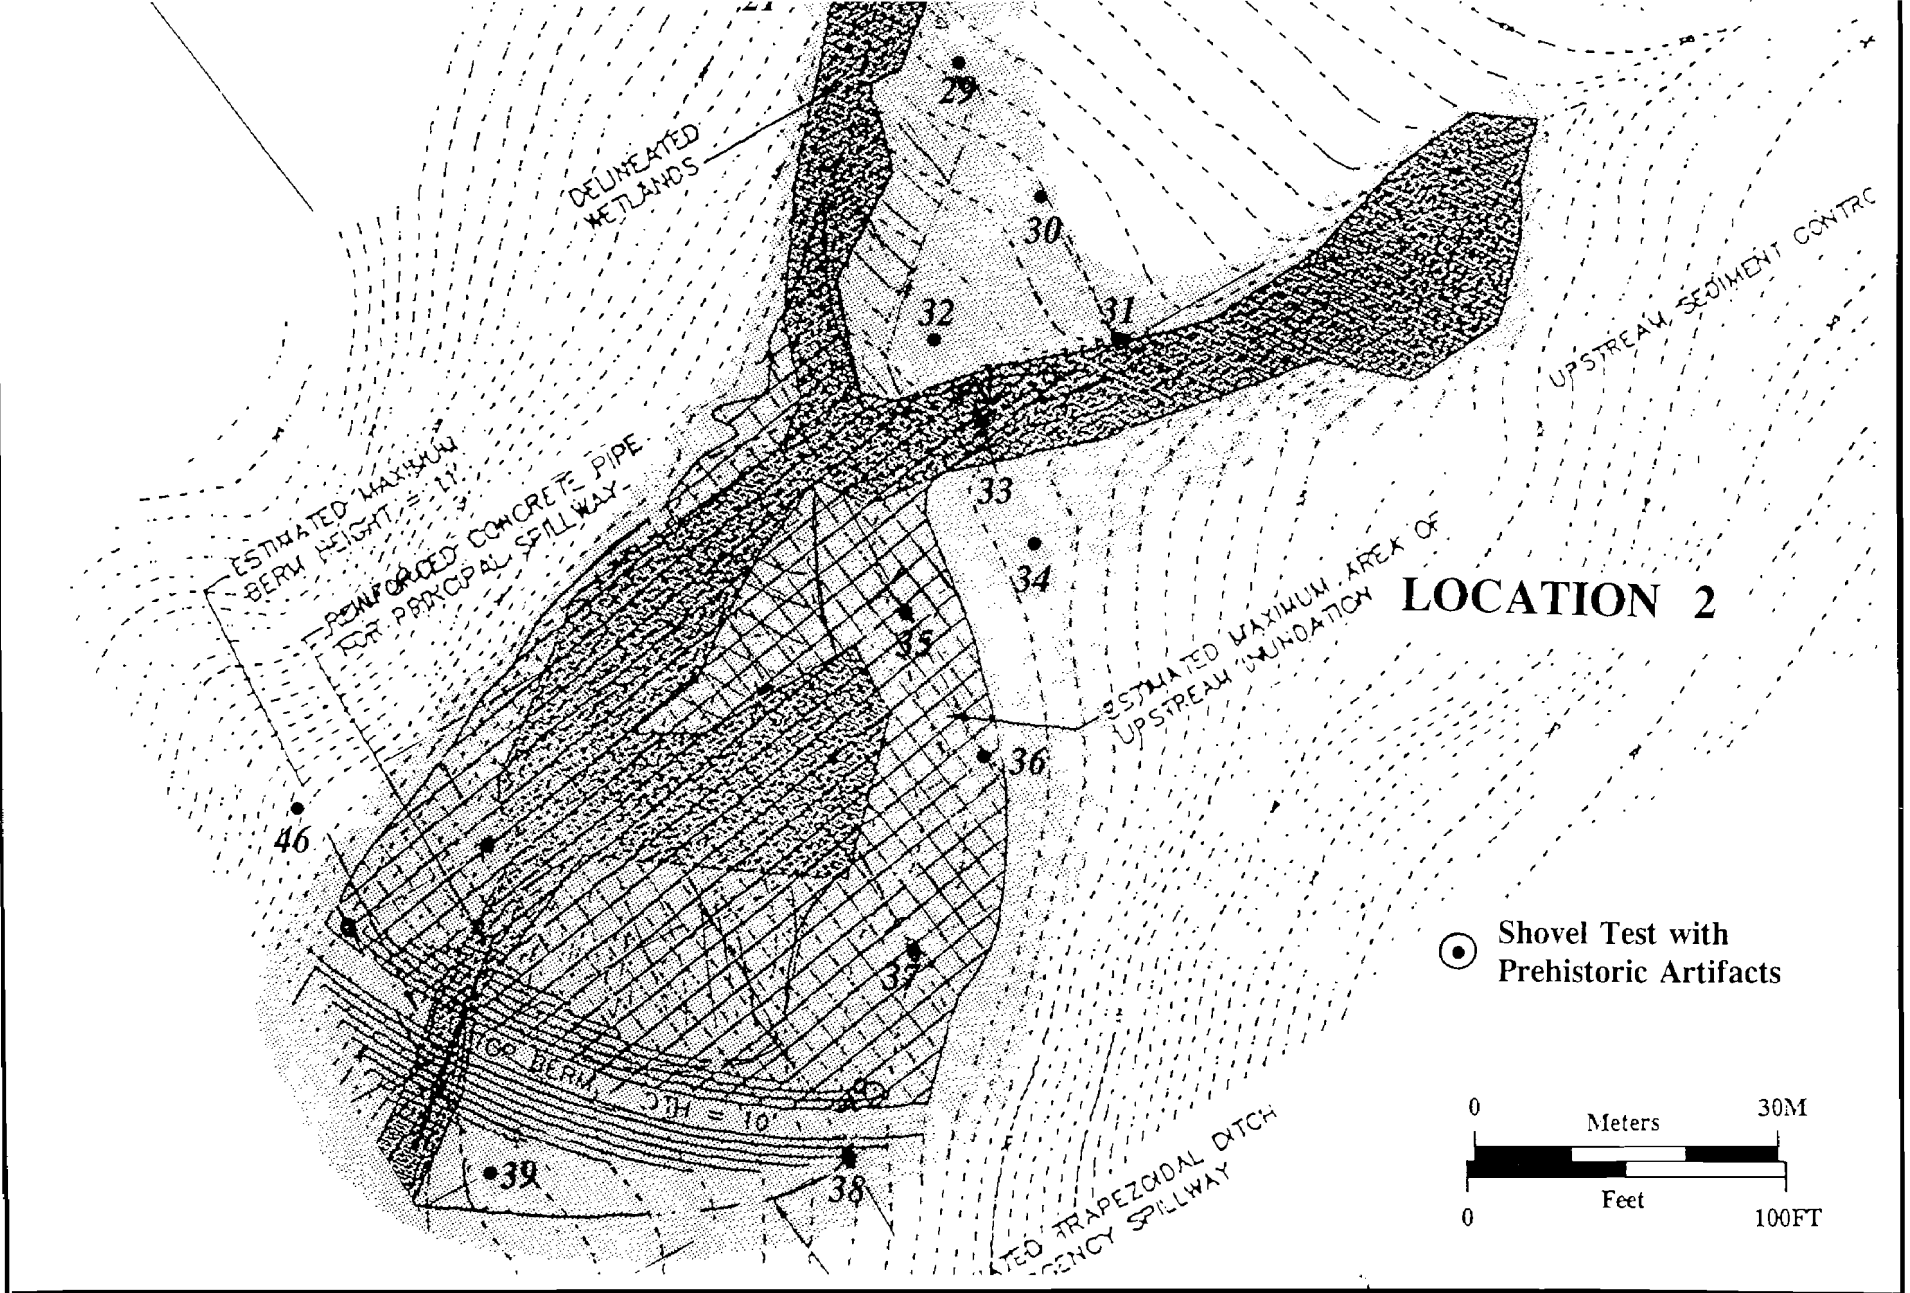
Project Plans Showing Locations of Subsurface Tests in Area 2. Intersection of S.R. 7 and Brackenville Road.
